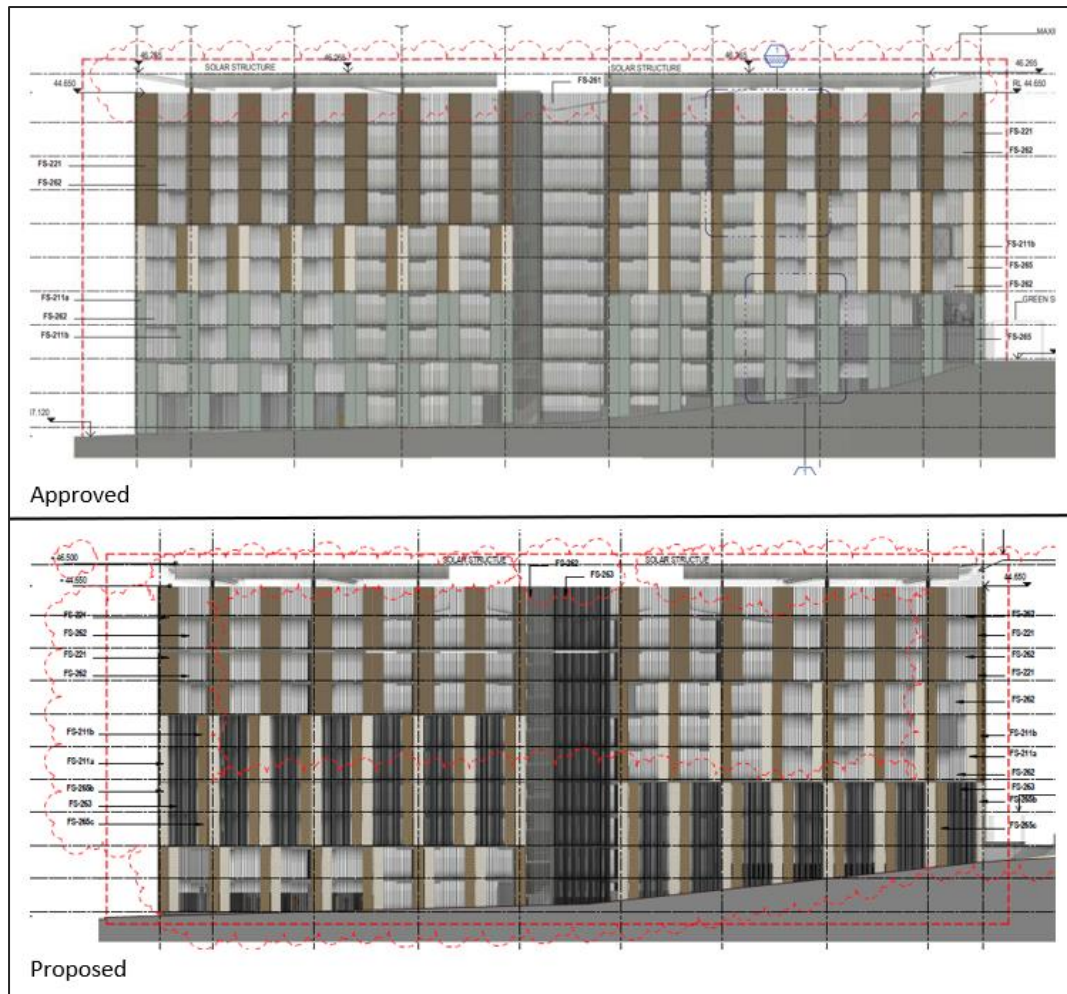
| Approved and proposed south elevations (Source: Modification Report)
